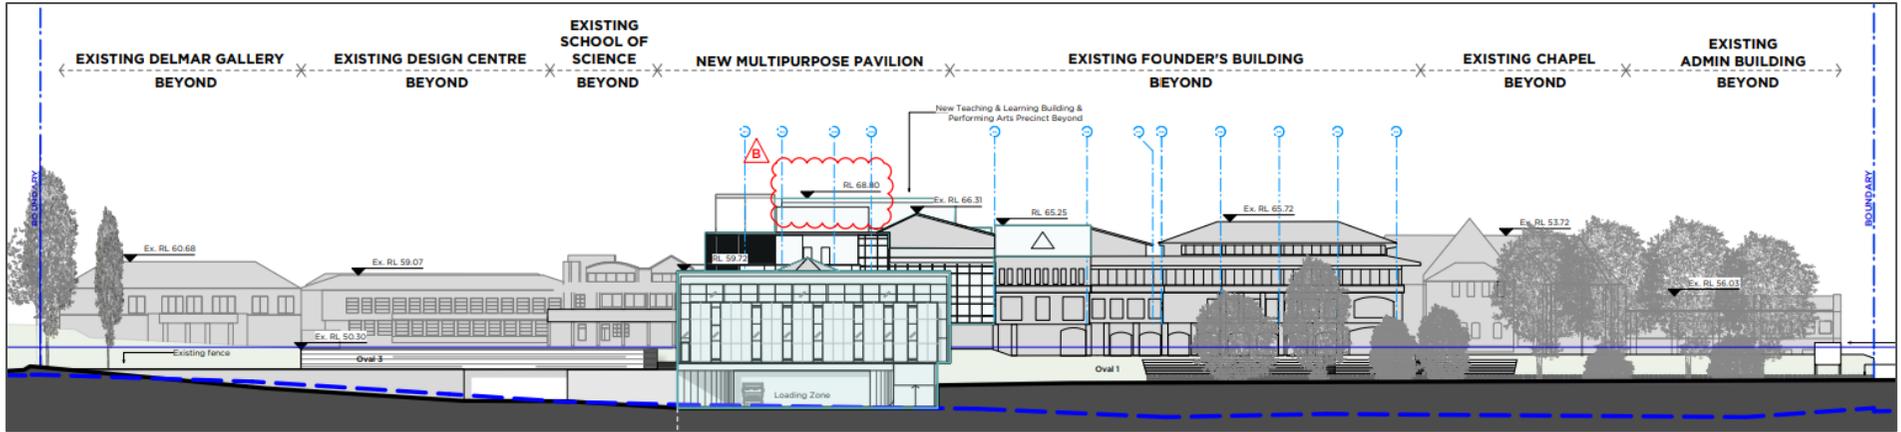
| Southern elevation (Yeo Park) (Source: Applicant's SRtS 2021)
